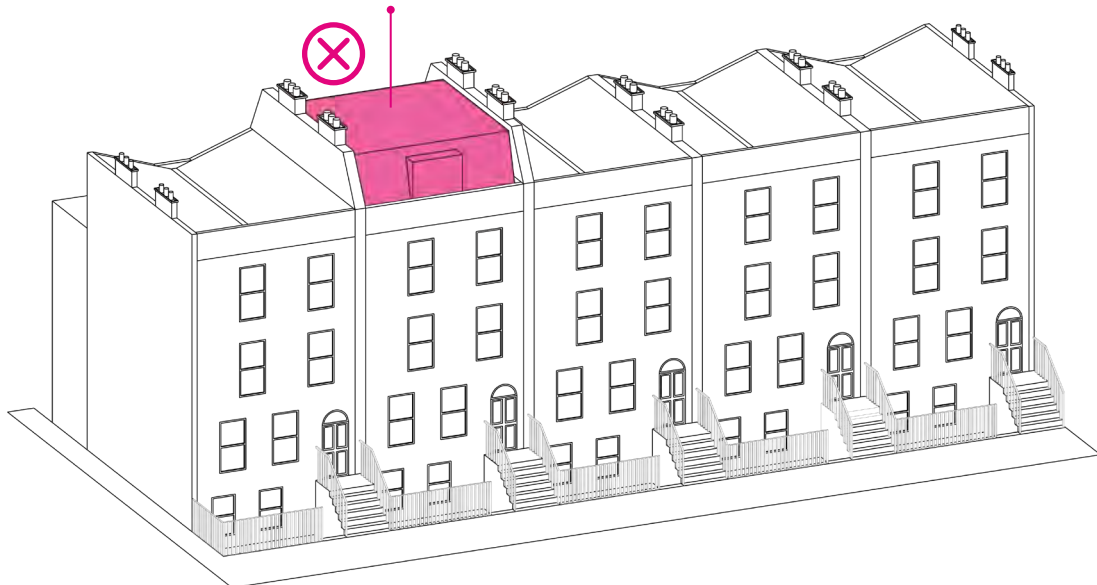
Mansard extension in an unbroken run of butterfly roofs - bad example
